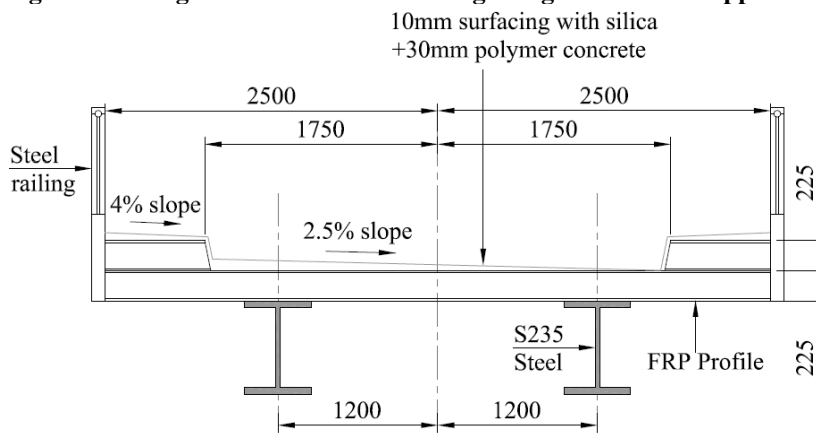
Cross-section of Friedberg bridge based on Knippers & Gabler (2008)
